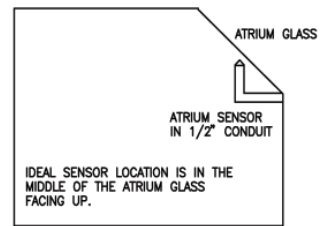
Figure C: Skylight DLC Mounting Location Using Outside Sensor
